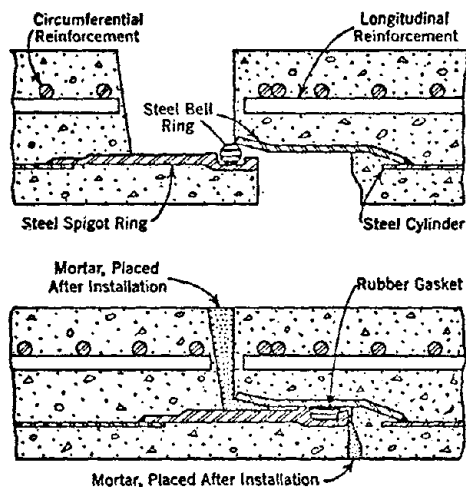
Cross Section of Nonprestressed Concrete Cylinder Pipe and Joint RCC
